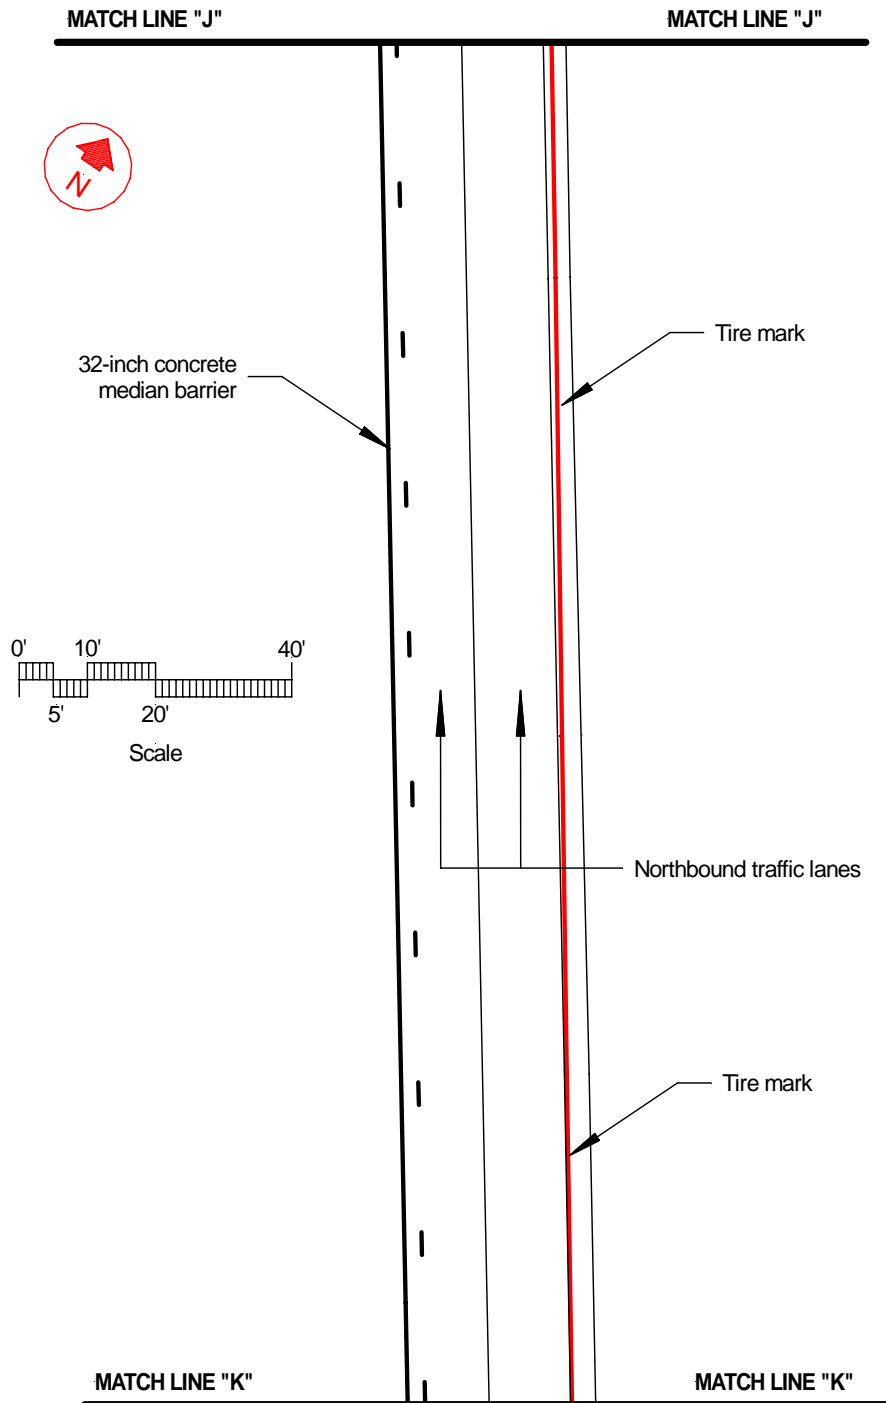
NTSB map of J-K pavement markings and roadway evidence.
